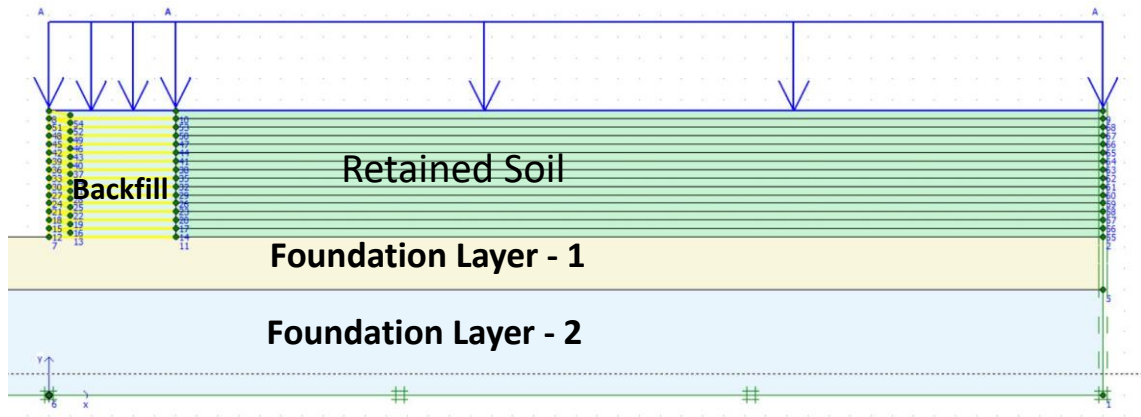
Geometry of Modelled Reinforced Earth Wall
